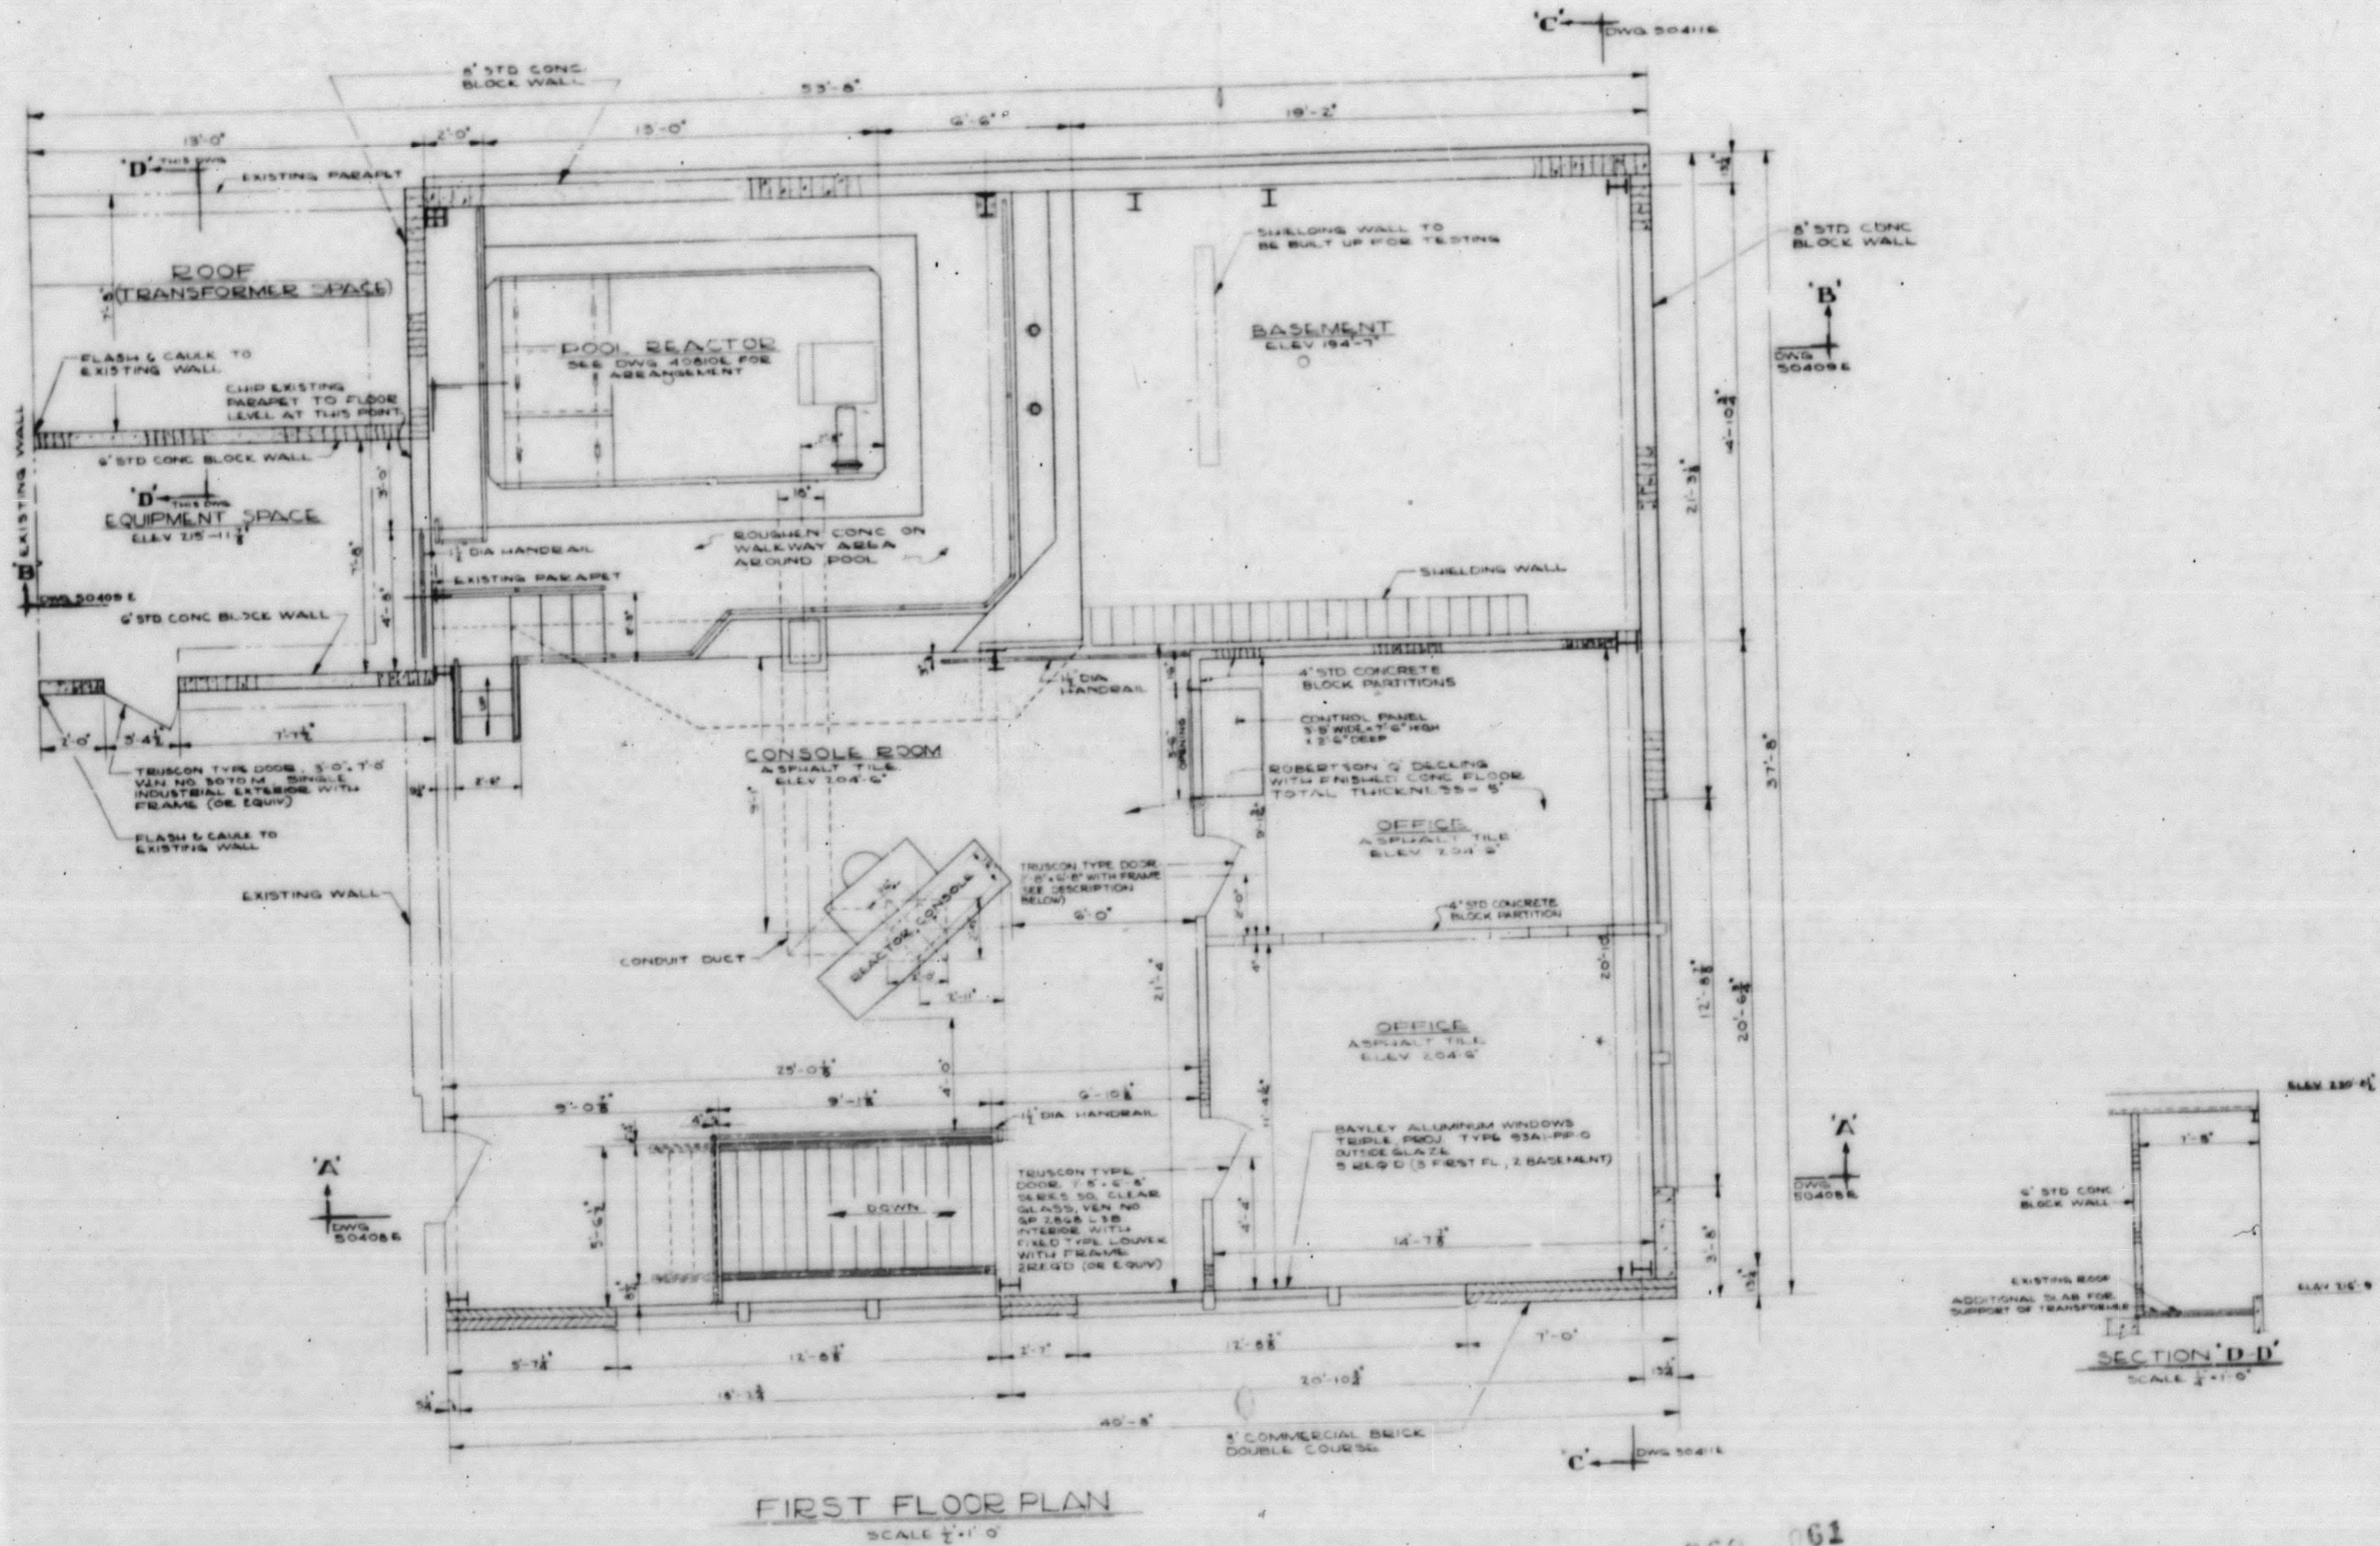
CRITICAL EXPERIMENT LABORATORY – FIRST-FLOOR PLAN
